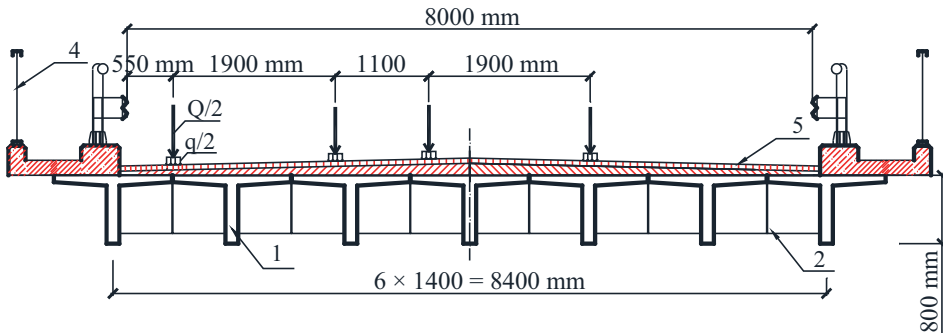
Cross section of reinforced concrete road-bridge superstructure with length of beam 14.06 m of typical drawing Issue 56: 1 – beam element, 2- diaphragm, 3- metal barriers, 4 – reinforced concrete sides
